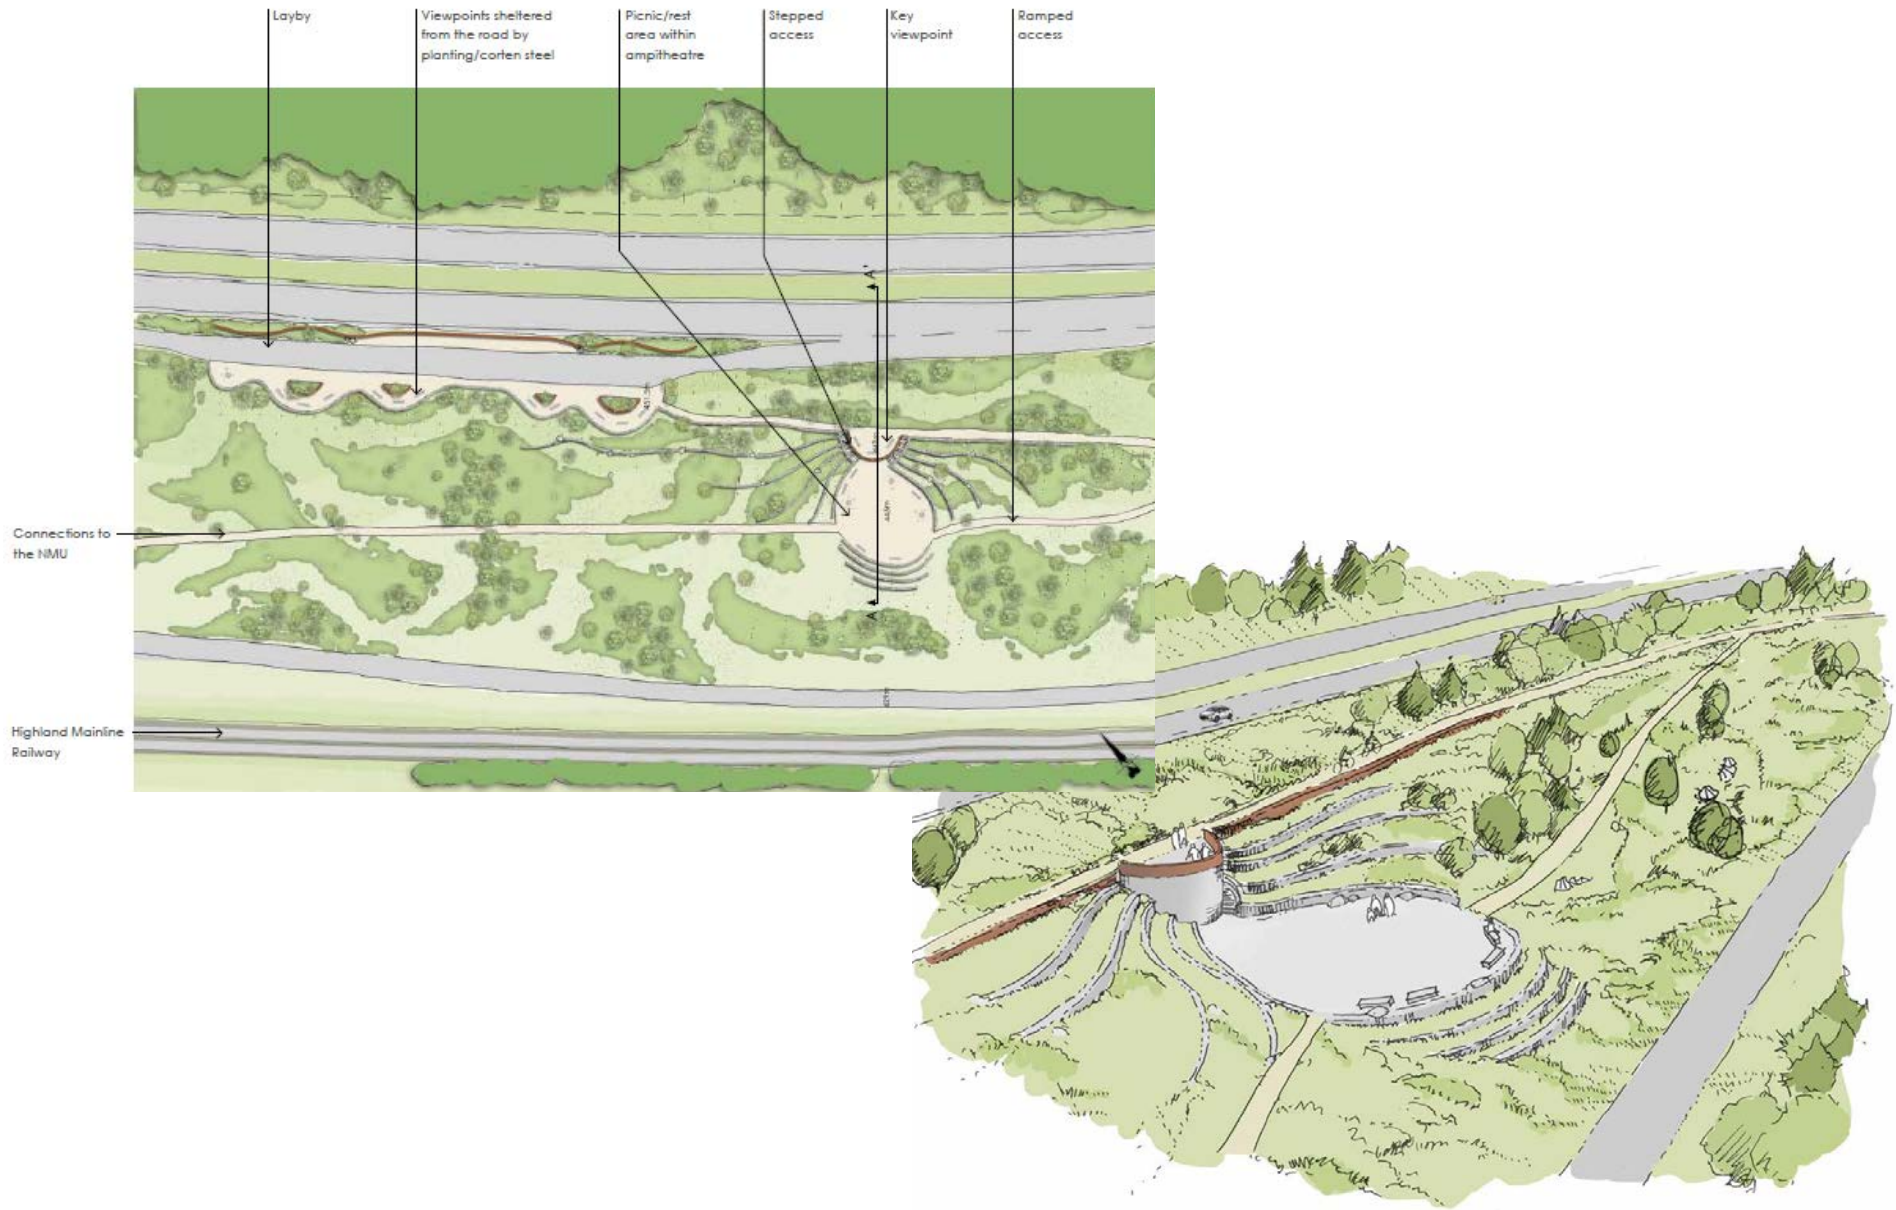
Illustrative impression and layout - NB lay-by proposal, Dalnaspidal (approx. ch. 800)
